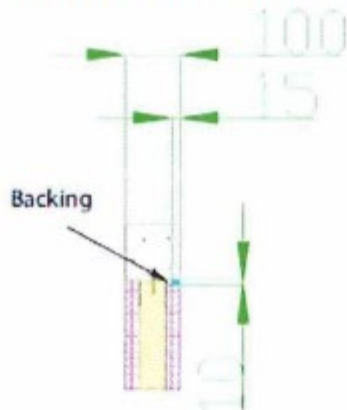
wall gypsum to stone thickness ≥ 100 mm
